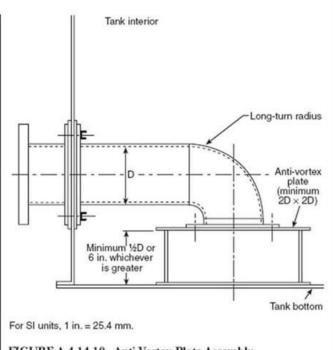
Anti-Vortex Plate Assembly.
